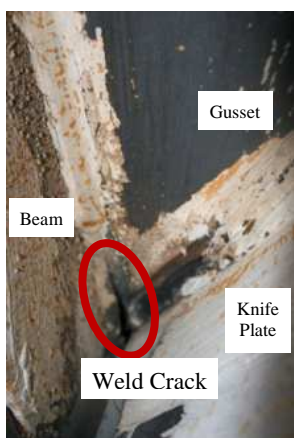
W2 in North Gusset-to-Beam Weld
